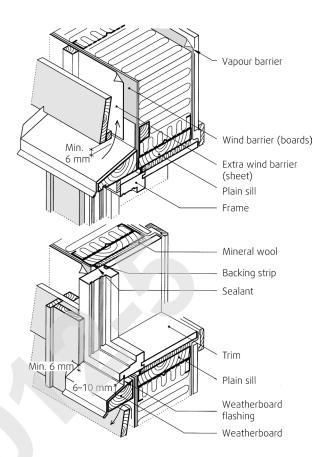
b Window installed in a wall with horizontal cladding on battens fixed to a wall framework made of thin steel profiles with a plain sill. Similar detailing can be used for vertical cladding if you want a special/ separate casing for the window. If the window is positioned in the outer part of the wall, it must be fastened securely using specially designed metal anchors.
